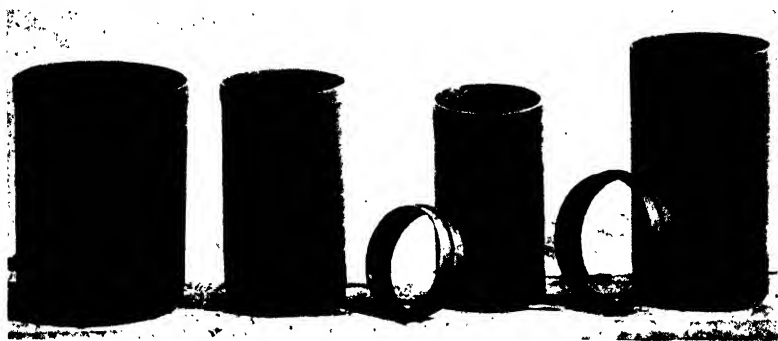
Sections of Pipe and Sleeve Connections. (Taken from *Underpinning*, by Prentis and White.)
